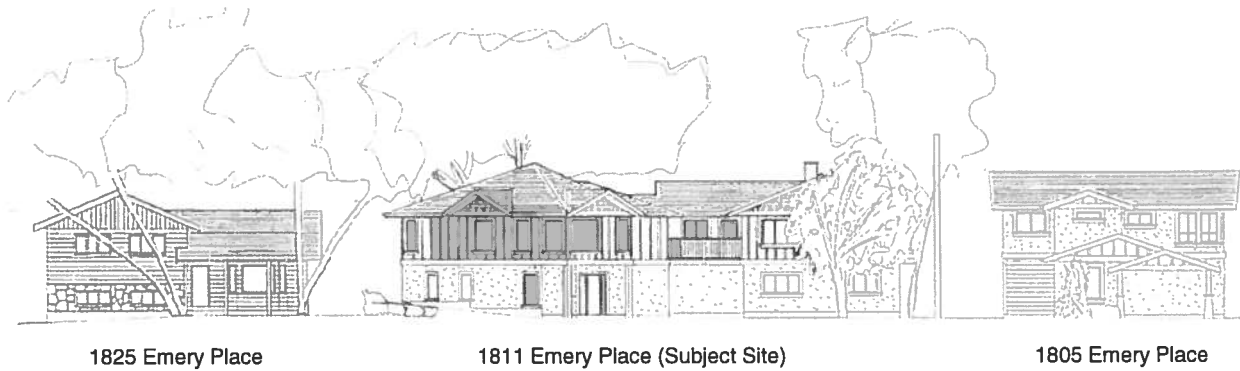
Proposed Streetscape (from plans by T-Square Design & Consulting)
